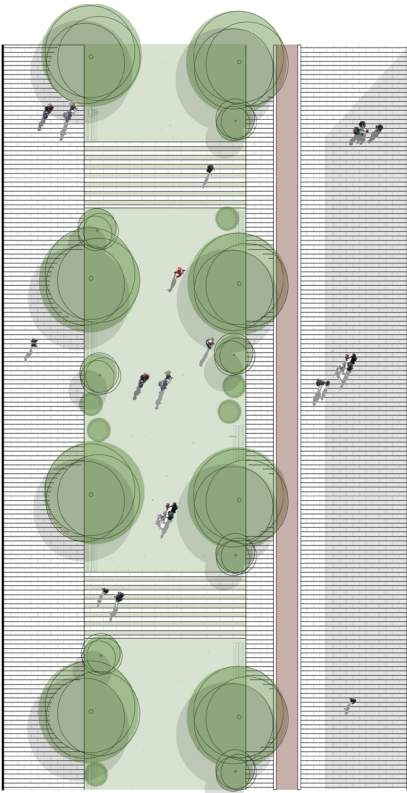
Illustration of the new Georgstreet - floor plan (own depiction)
